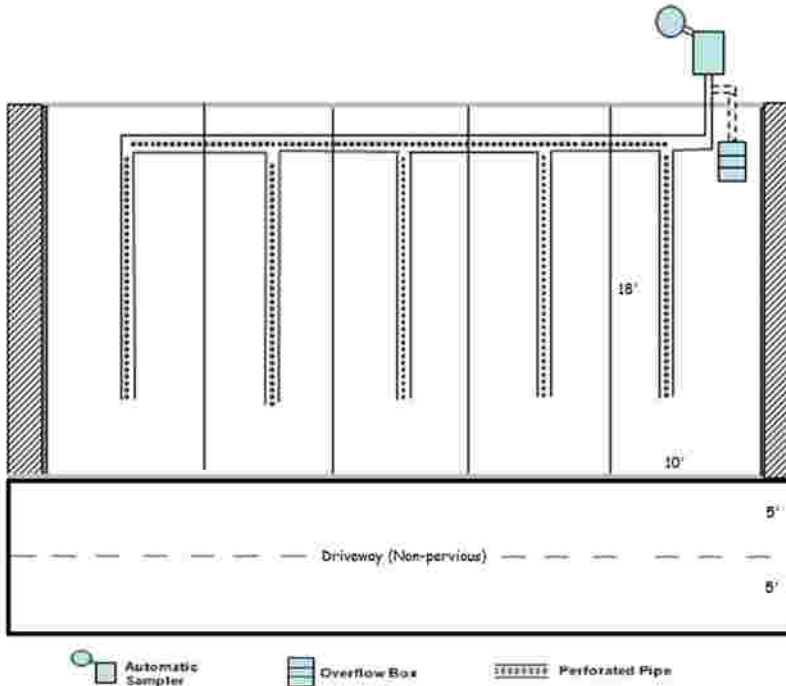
Design of monitoring system (5 parking spots) of permeable pavement
